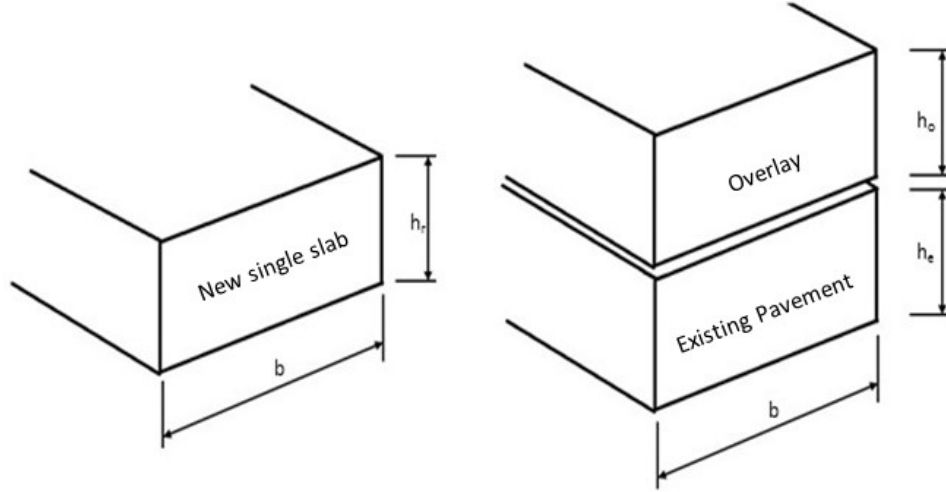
New single slab with thickness h_r combination of concrete overlay with thickness h_o and existing pavement h_e (Chou 1985)
